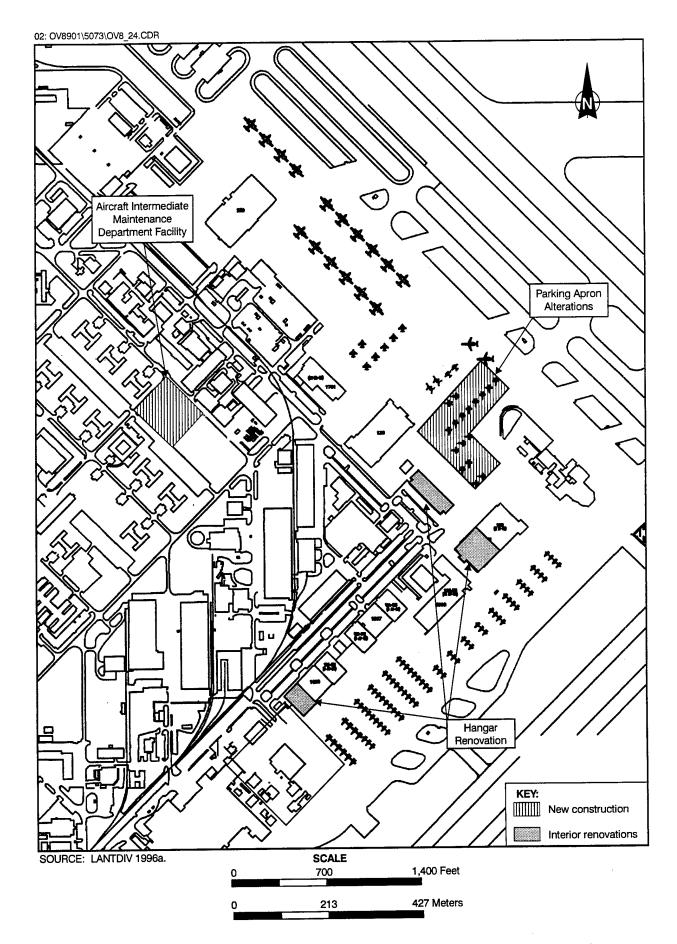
CONSTRUCTION NEEDED AT MCAS CHERRY POINT TO SUPPORT ARS 3
